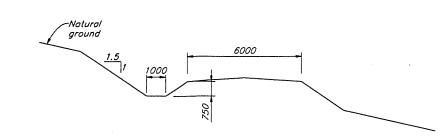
DETAIL A MAIN EMBANKMENT SEEPAGE COLLECTION POND Scale A
